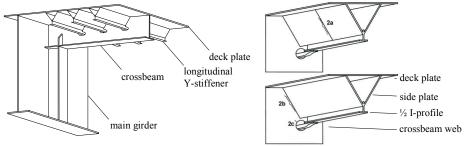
Schematic illustration of an orthotropic steel highway bridge deck with longitudinal Y-stiffeners
